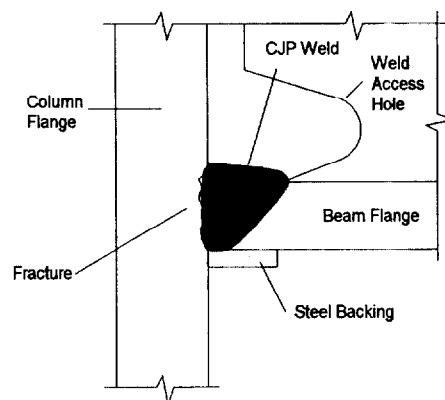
Fracture of Complete Joint Penetration Flange Weld
